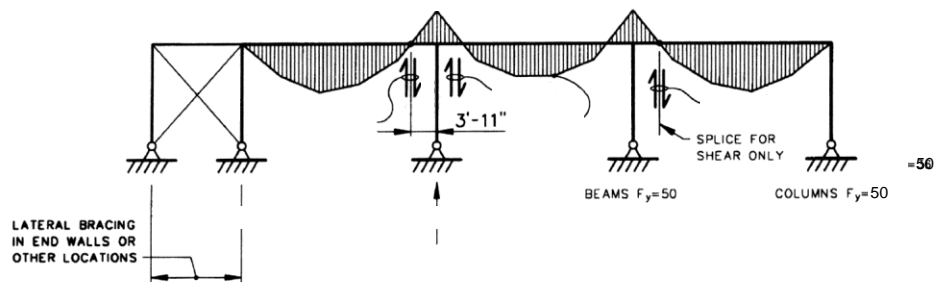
(c) Type SF — cantilever-suspended span system, braced against sideway
